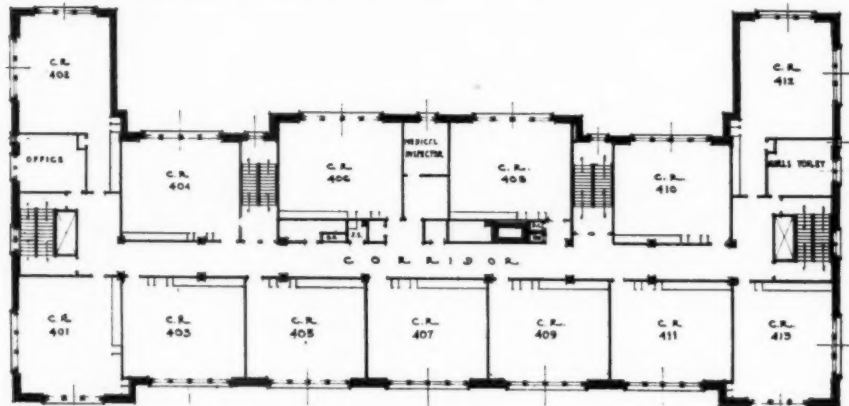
FOURTH FLOOR PLAN. TYPE "A" ELEMENTARY OR INTERMEDIATE SCHOOL
